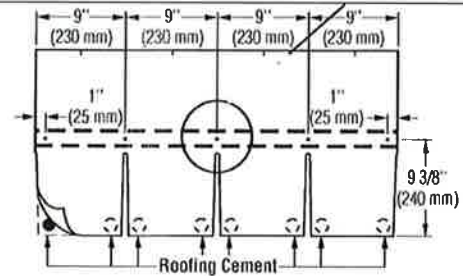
Fastening Hatteras Shingles on Steep Slopes
